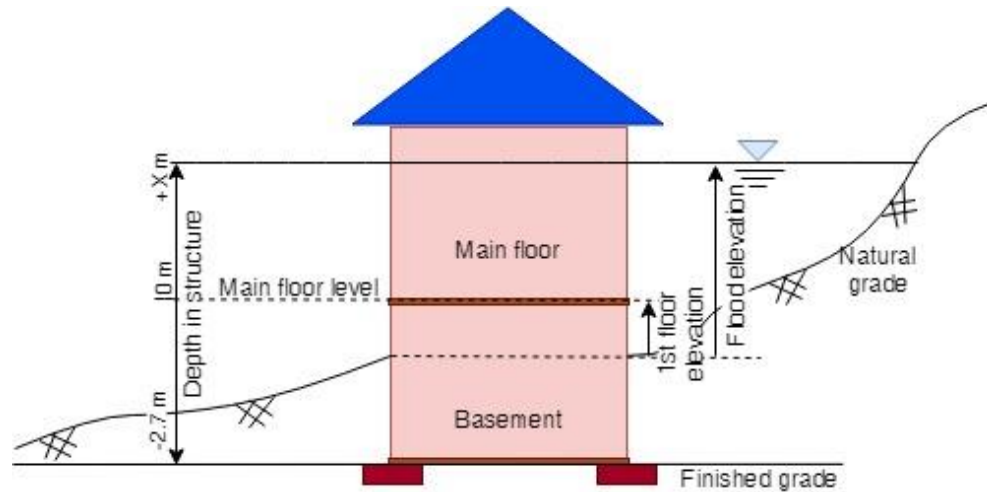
Depth in structure determination from the main floor elevation and flood elevation data. Here, depth of water in structure (measured from main floor level) = Depth of flood above ground – Main floor level.
